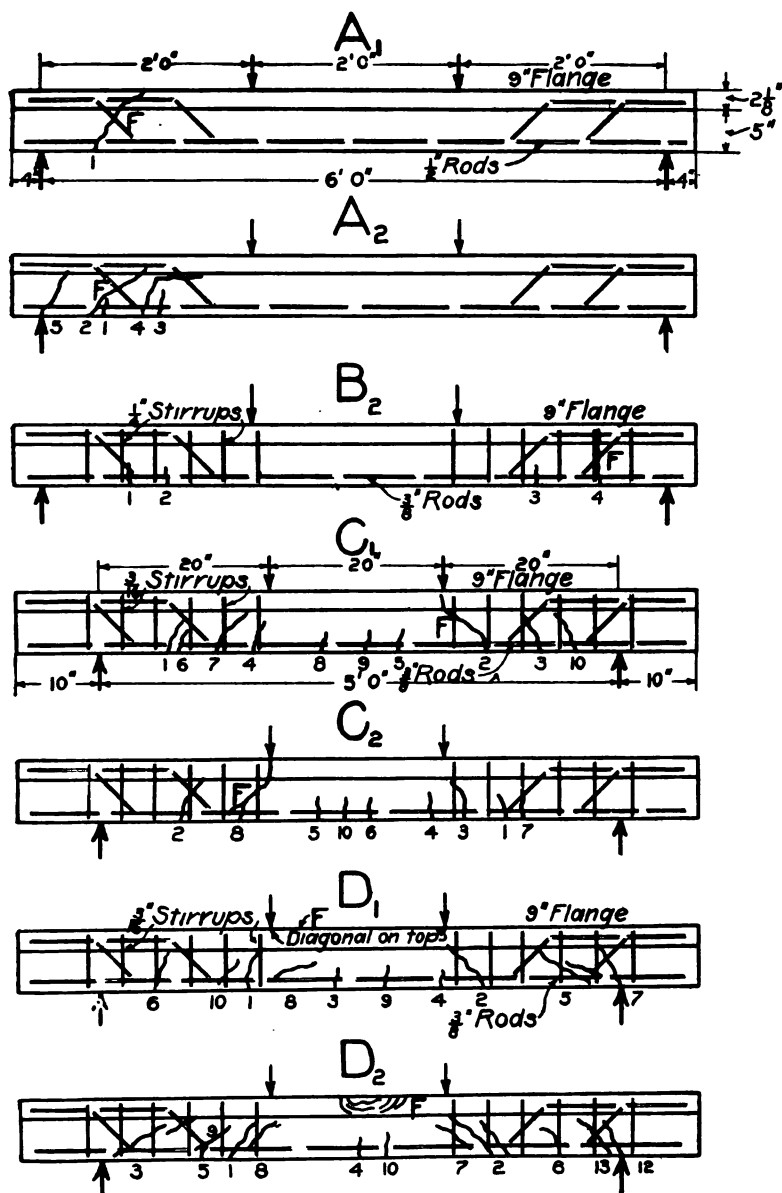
TEE BEAMS—REINFORCEMENT AND CRACKS.
